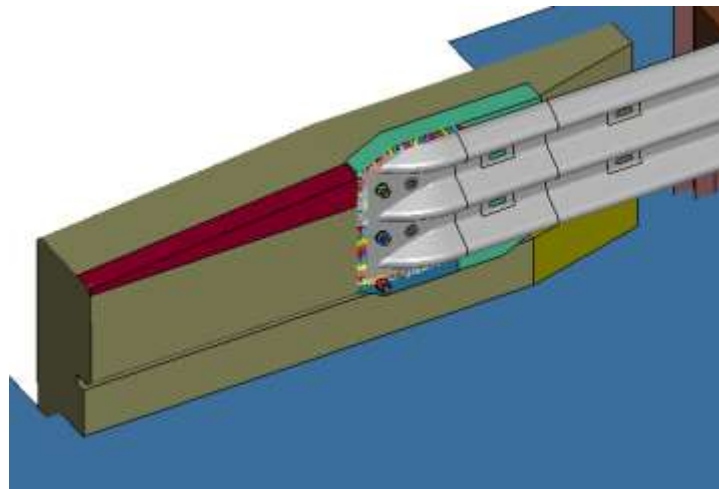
Concrete Fill (red) Placed above Connection Blockout, Buttress 2
